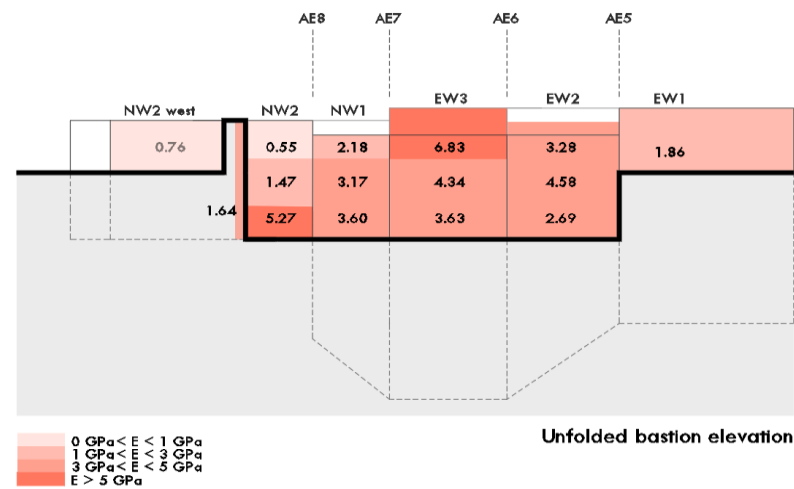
Unfolded tower elevation showing mean E_d values calculated.
